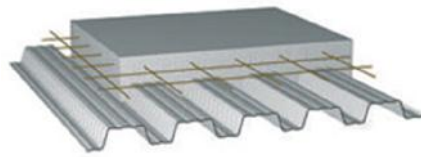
A typical steel-concrete composite slab with trapezoidal decking.
